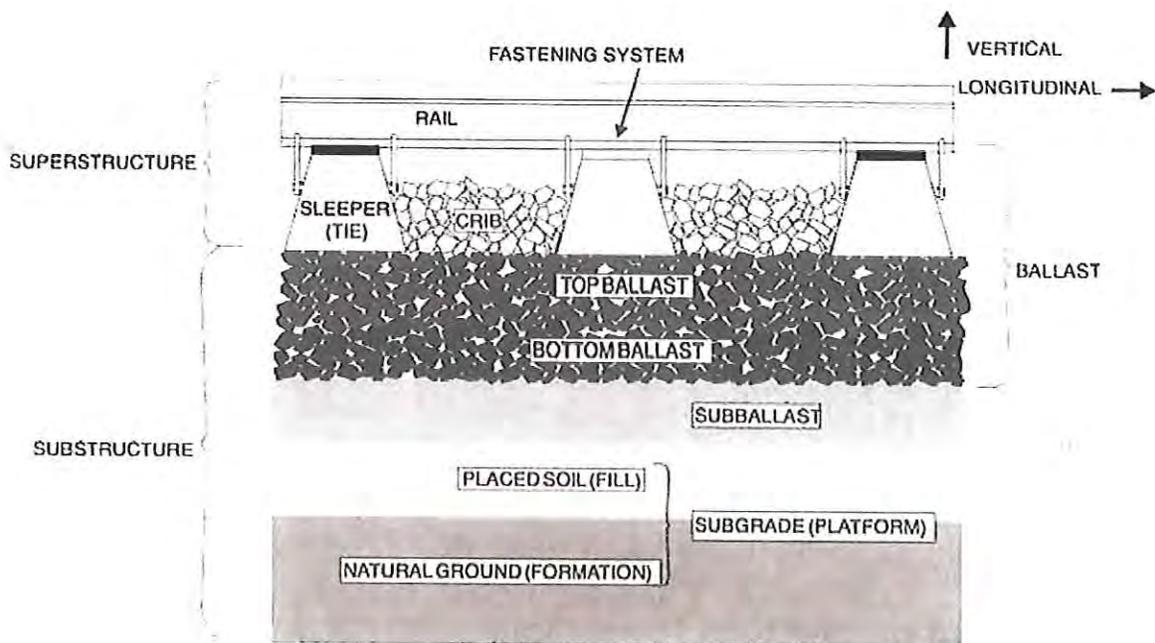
Track layout of a typical ballasted track- side view (Selig & Waters, 1994).
